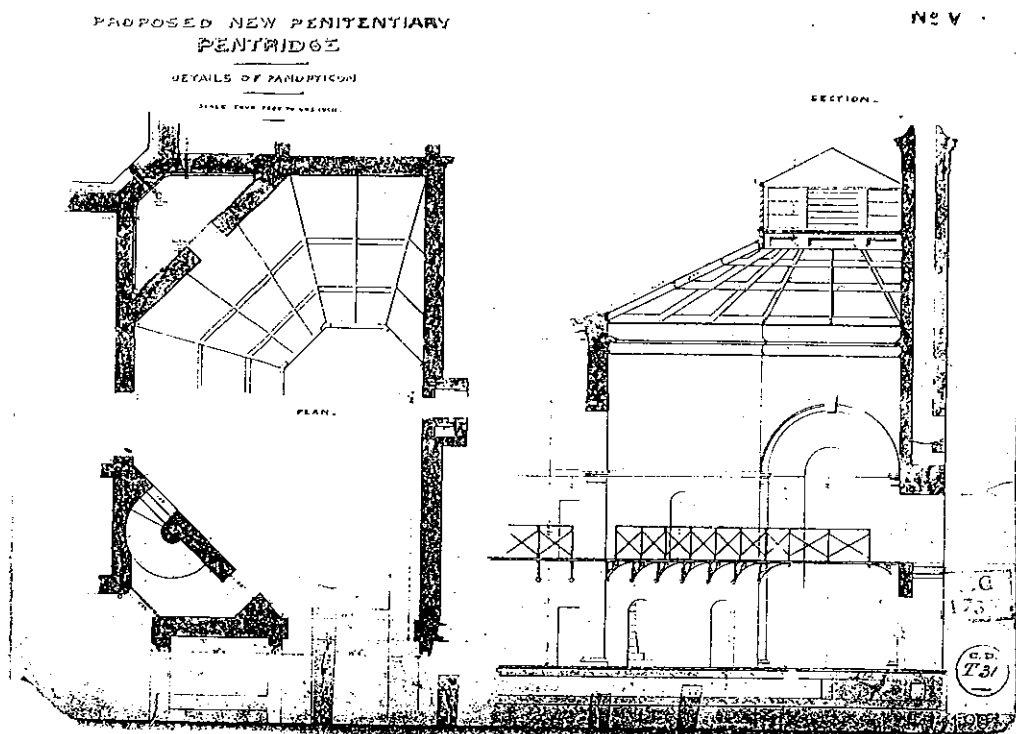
Proposed New Penitentiary. Pentridge. Details of Panopticon. c. 1858 contract drawing, showing sub-floor ventilation duct and thermo-ventilation furnace and stack. Office of Building microfilm no PGP 1.91
